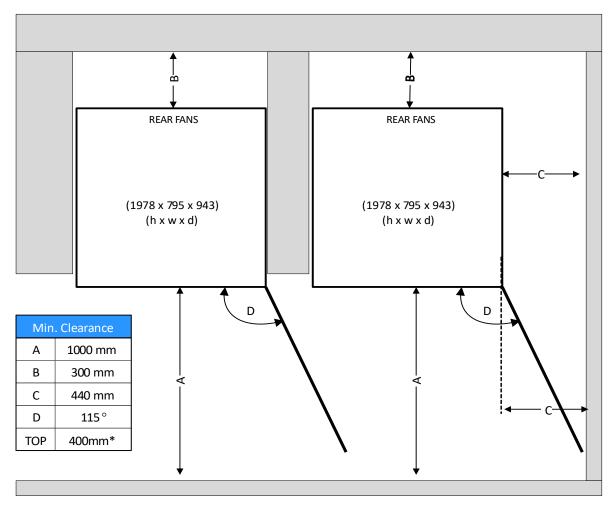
Clearances for a Kohler PW 9250DPA stand-alone cabinet
